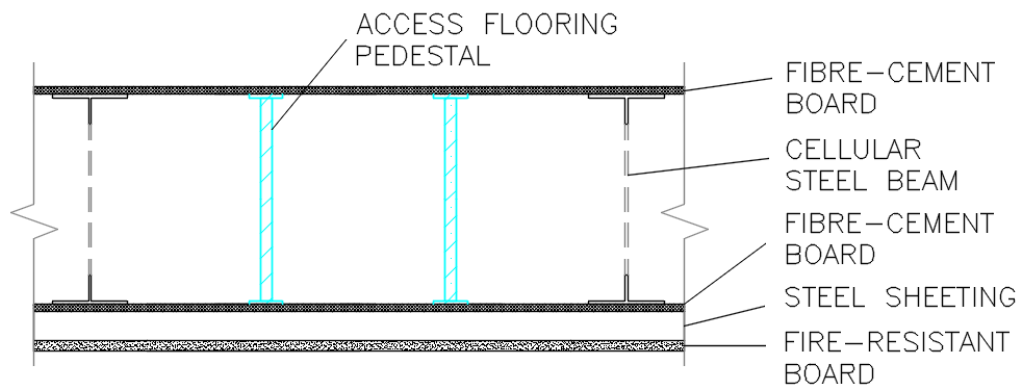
Side elevation view of the sandwich floor system showing pedestals for access flooring between the cellular beams
